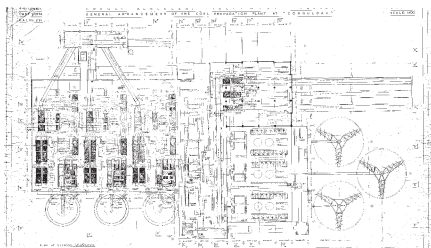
Wash Plant preserved buildings. Storage Unit, towers, wash plant building.
